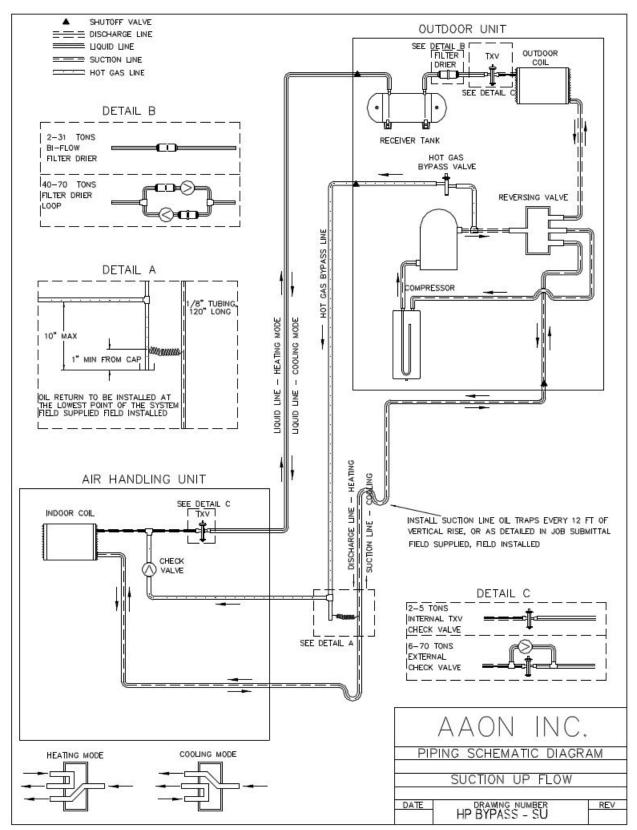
Heat Pump with Hot Gas Bypass Split System Piping, Suction Up
